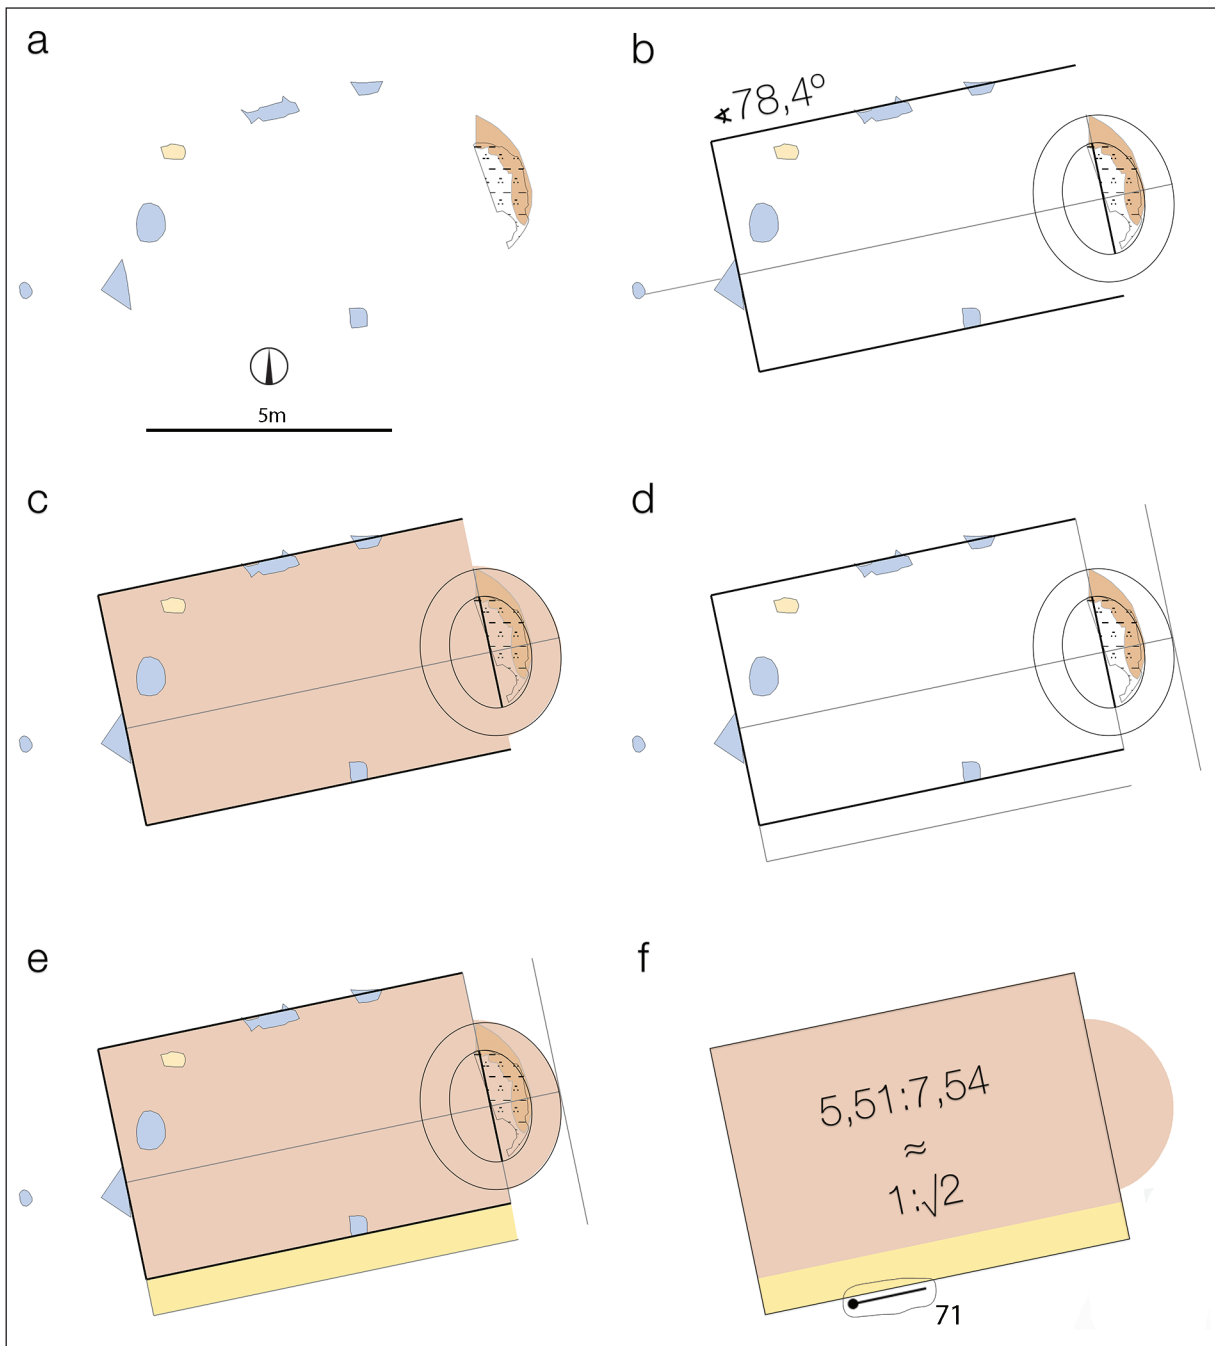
Bled Island, Phase 2a, first building with semicircular apse, reconstruction of the ground plan: a – archaeological remains (purple for pits, light brown for mortar pavement, dark brown for wall foundations); b – reconstruction of the outer walls and the central axis of the apse; c – reconstruction of the ground plan; d – idealised south wall taking into account symmetry; e – reconstruction of the actual (brown) and the idealised (yellow) ground plan; f – length-width proportions of the idealised ground plan.
